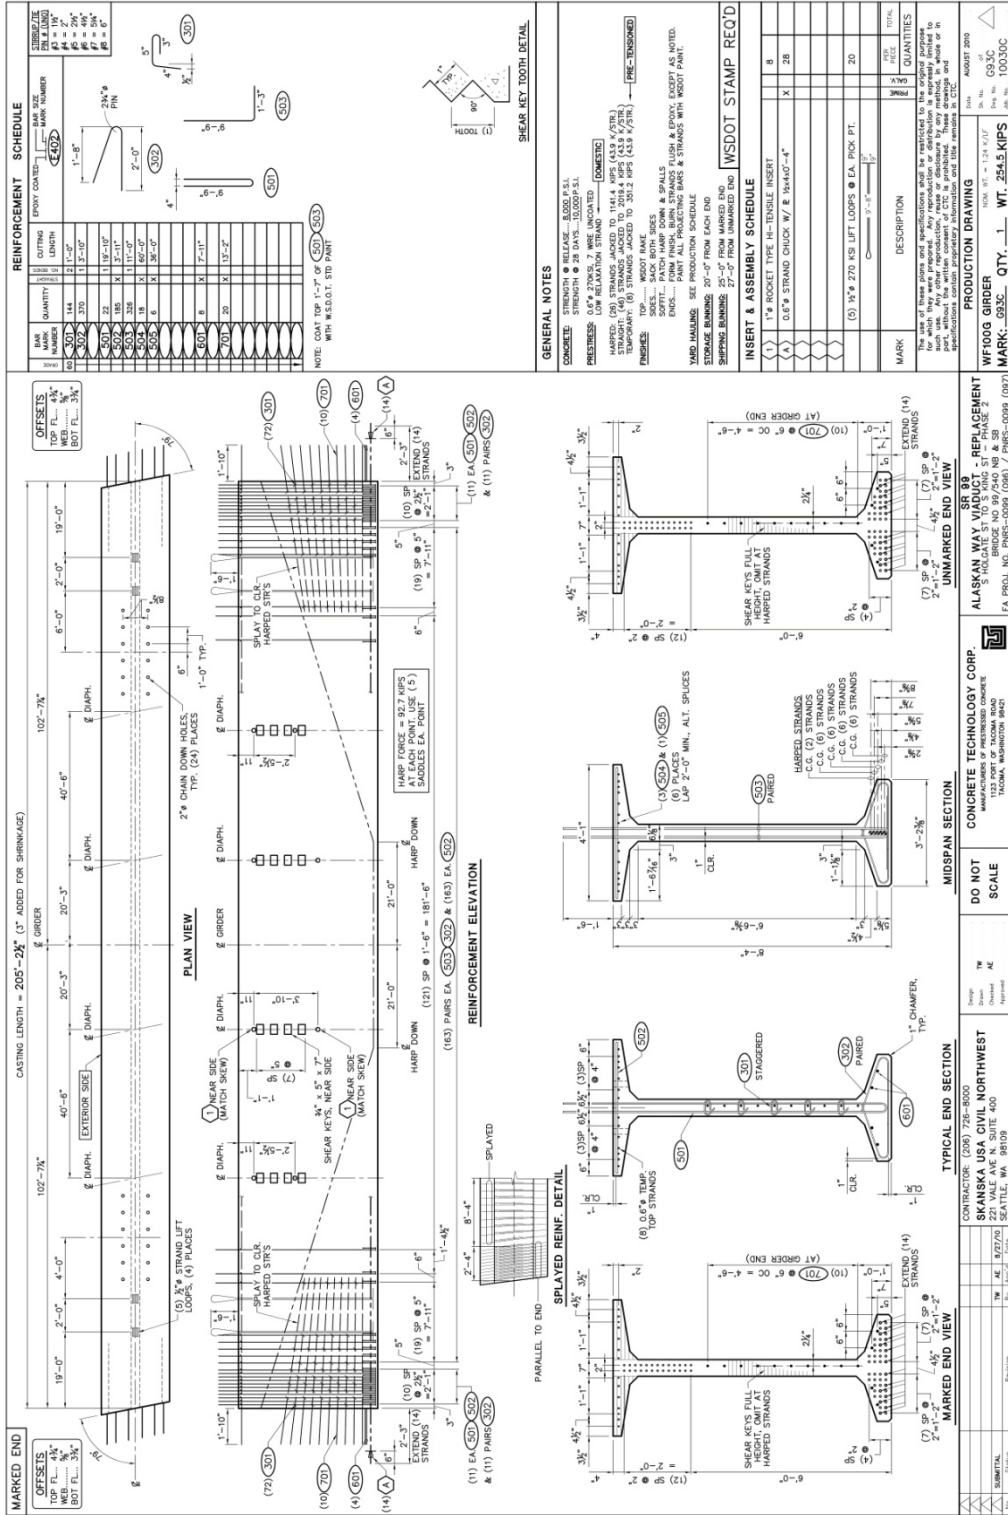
Fabrication shop drawings for BWF100 G93C girders (CTC, 2010).
